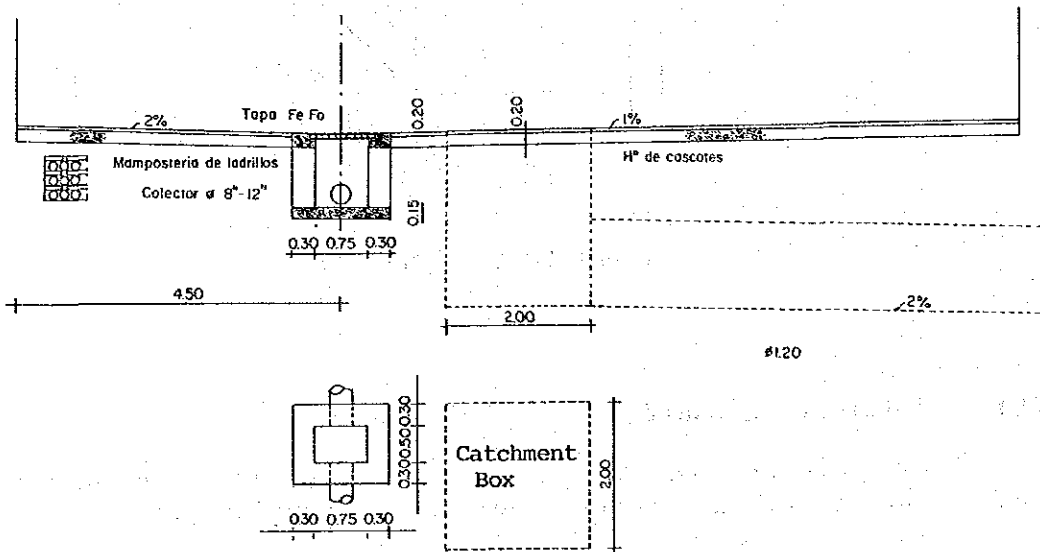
CROSS SECTION OF DRAINAGE FACILITY
